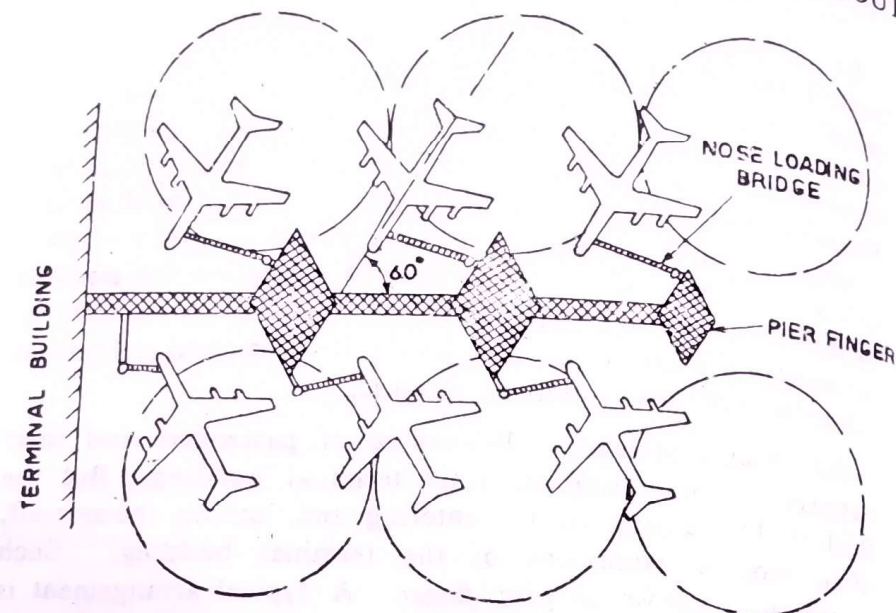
Schematic Diagram of Gate Position, Pier Finger and Nose Loading Arrangement
